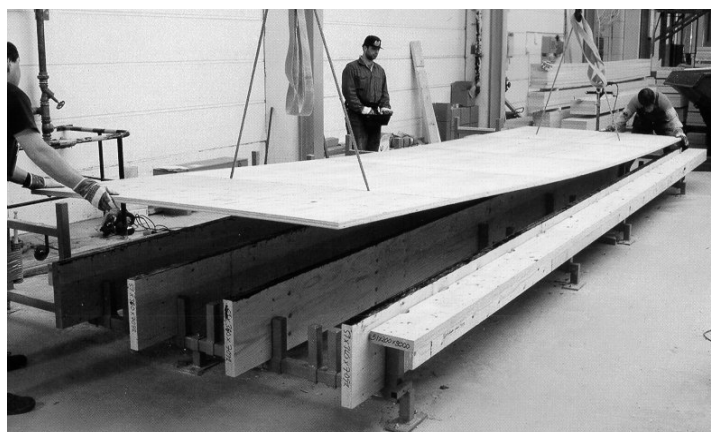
Assembly of pre-fabricated RF-glued stressed skin panel
